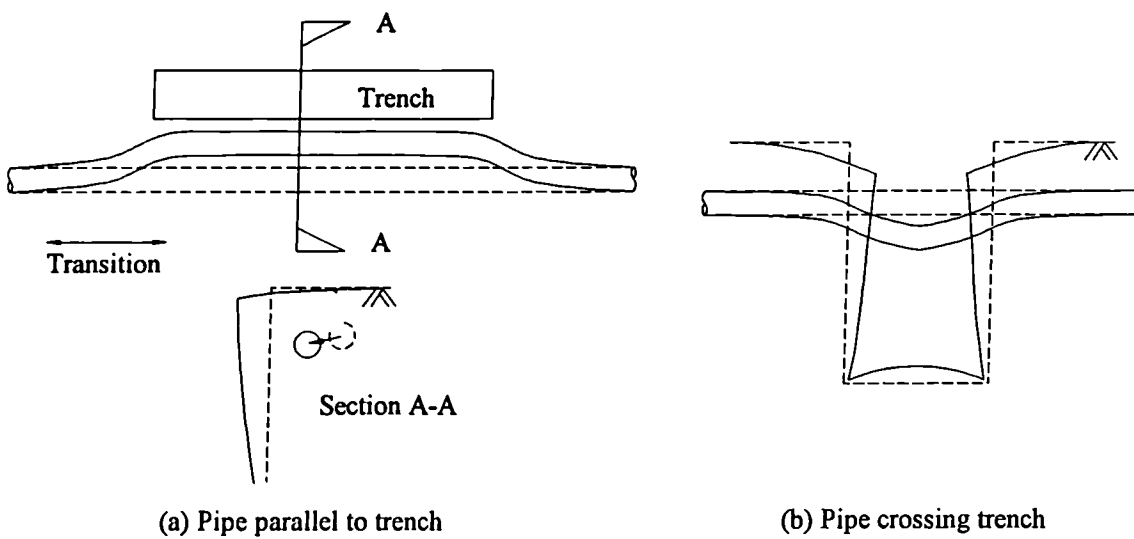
Ground and pipe deformation due to trench excavation.
